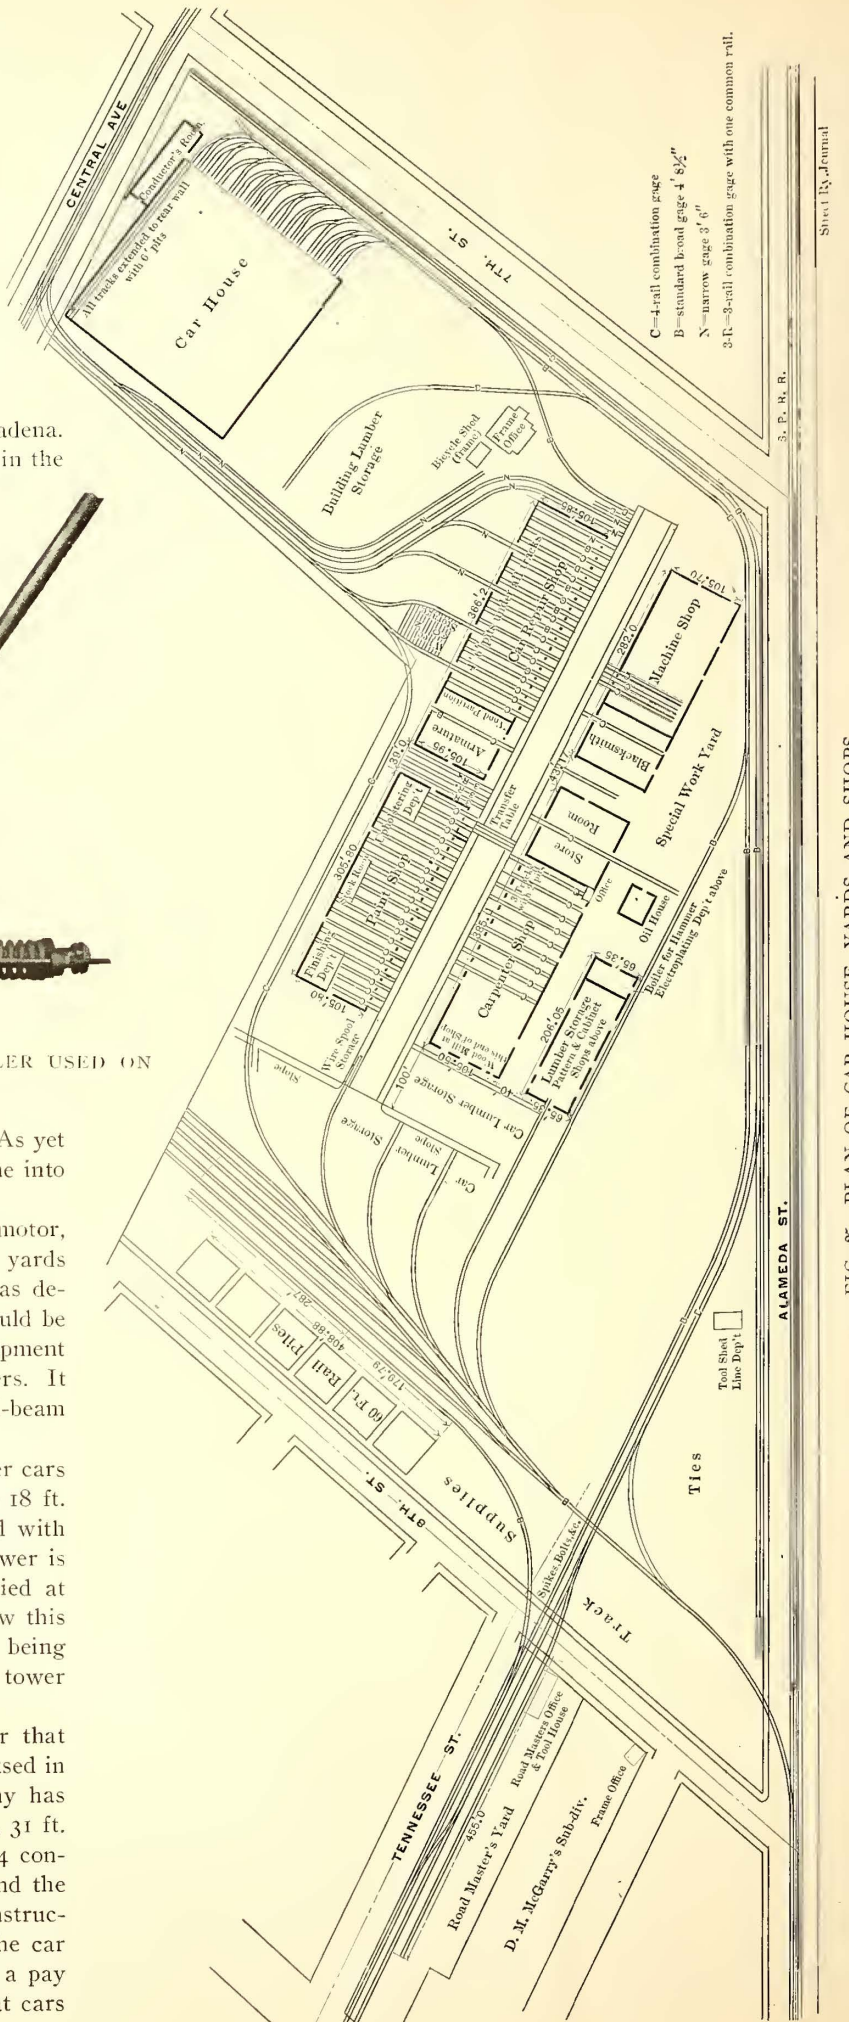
PLAN OF CAR HOUSE, YARDS AND SHOPS
